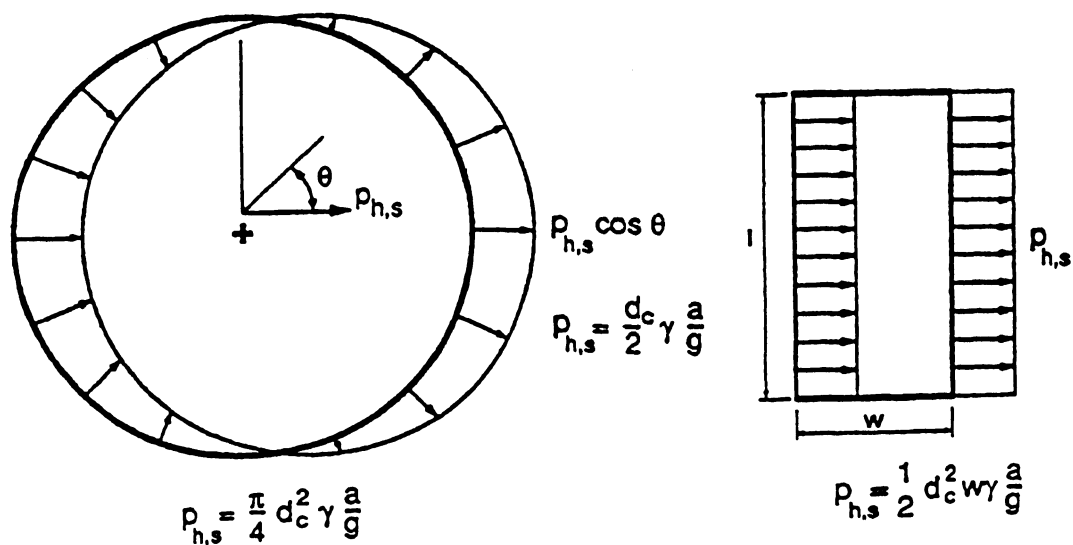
Plan view of the additional horizontal pressure due to seismic actions on the vertical walled sections of silos with circular and rectangular cross section shapes
